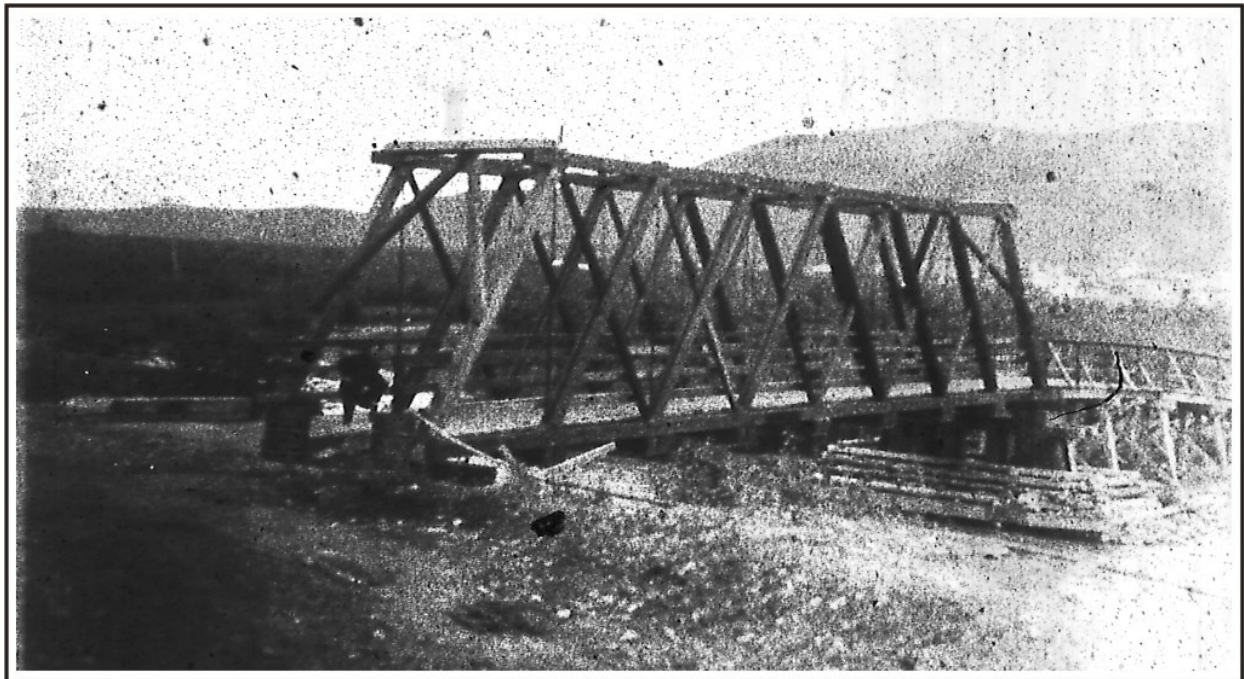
An 80-foot Howe timber truss bridge at Mile 32 on the Richardson Highway, late 1920s. U.S. Alaska Road Commission Collection, PCA 61-5-262, Alaska State Library.
